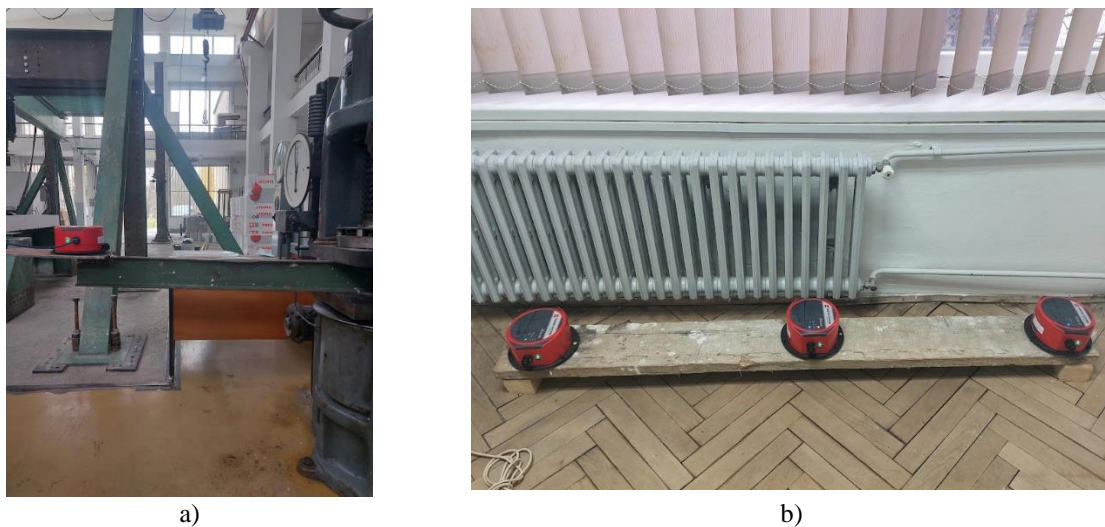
Simple tests: a) INP 120 cantilever steel beam; b) wooden plank 20/5 cm.
